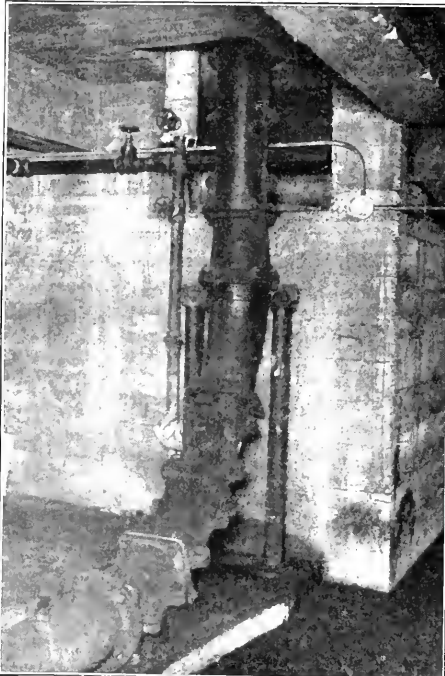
BEND AT WHICH STEAM NOZZLE IS INTRODUCED
